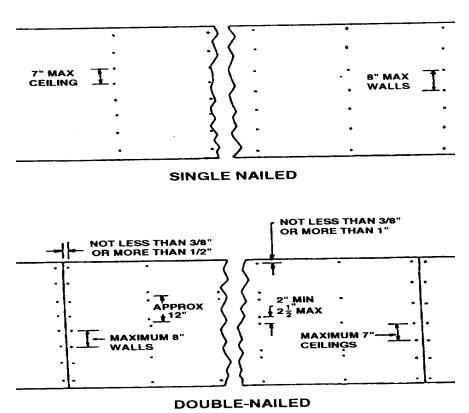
, Spacing for Single and Double nailing of Gypsum Drywall.
